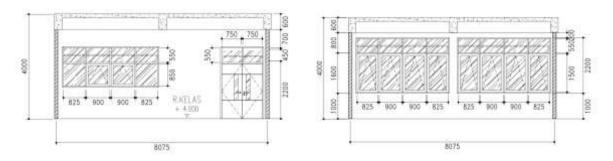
Section of Opening Dimension Changes (Source by Author, 2024)
